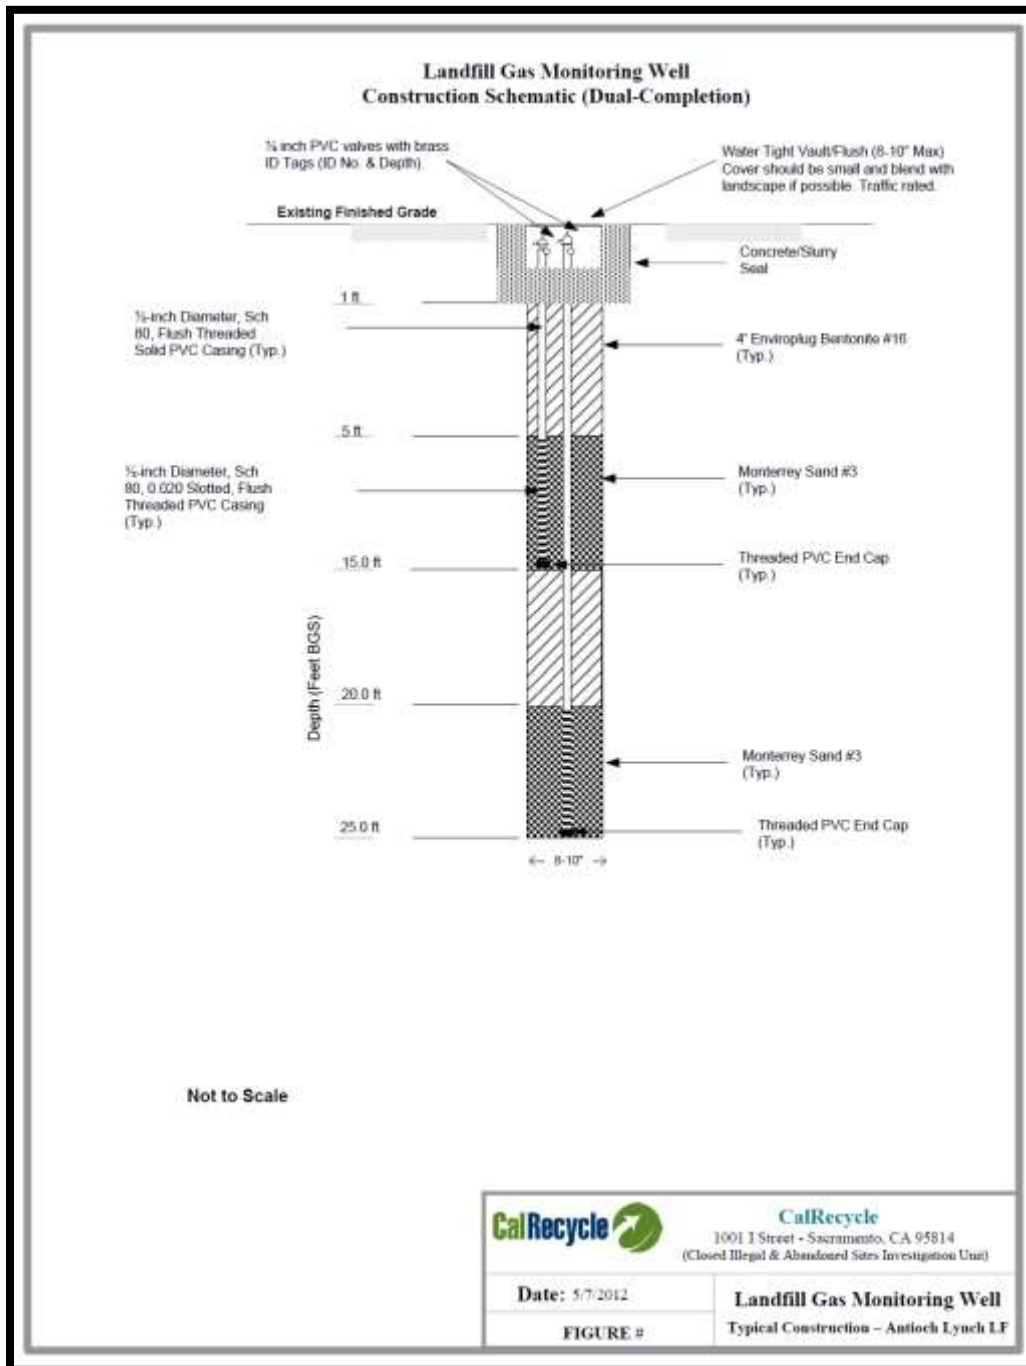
Drawing showing typical construction of a dual-depth landfill gas monitoring well
